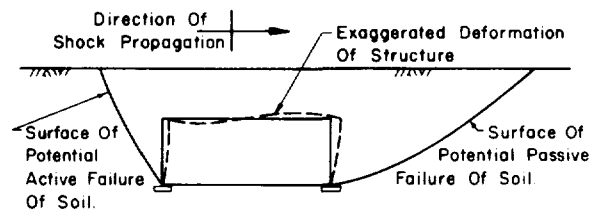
POTENTIAL SURFACES OF FAILURE IN SOIL SURROUNDING A STRUCTURE
